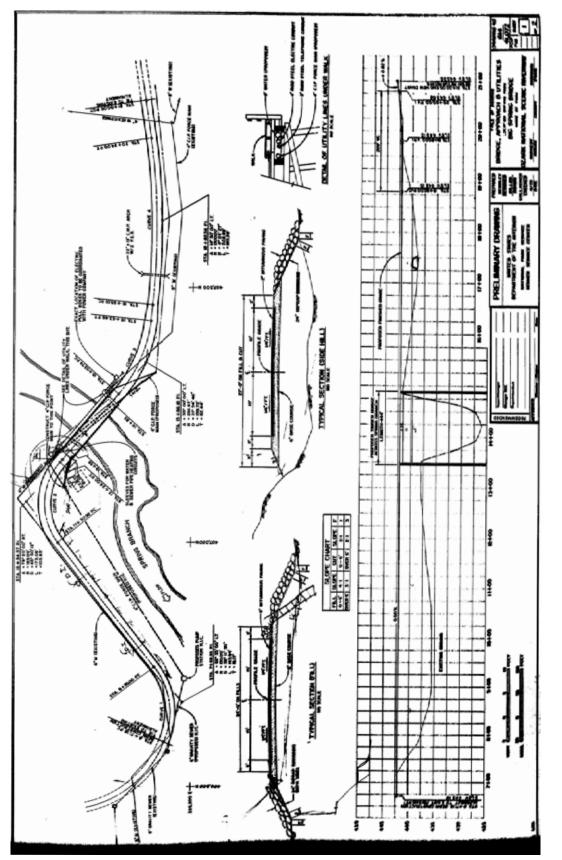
NPS prepared plans to replace the Big Spring Branch Vehicular Bridge, 1975. (OZAR Archives)
